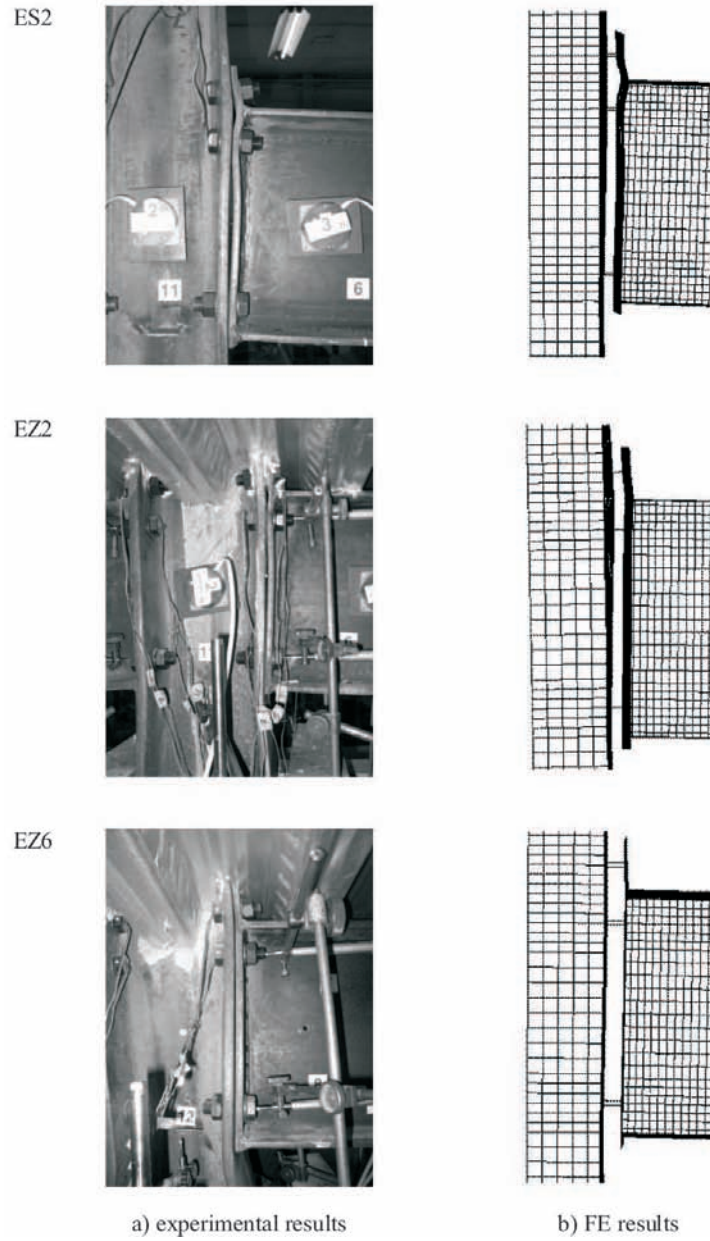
Deformed shape of joints with 10 mm extended end-plates.
